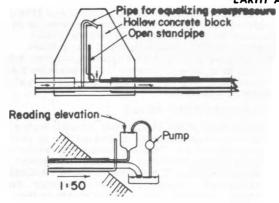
Vertical Settlement Device in Rockfill, Messaure Dam
